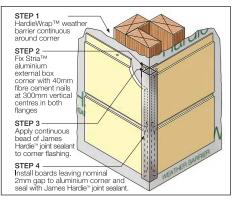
STRIA 14MM EXTERNAL BOX CORNER - STANDARD AND WIDE PROFILES
